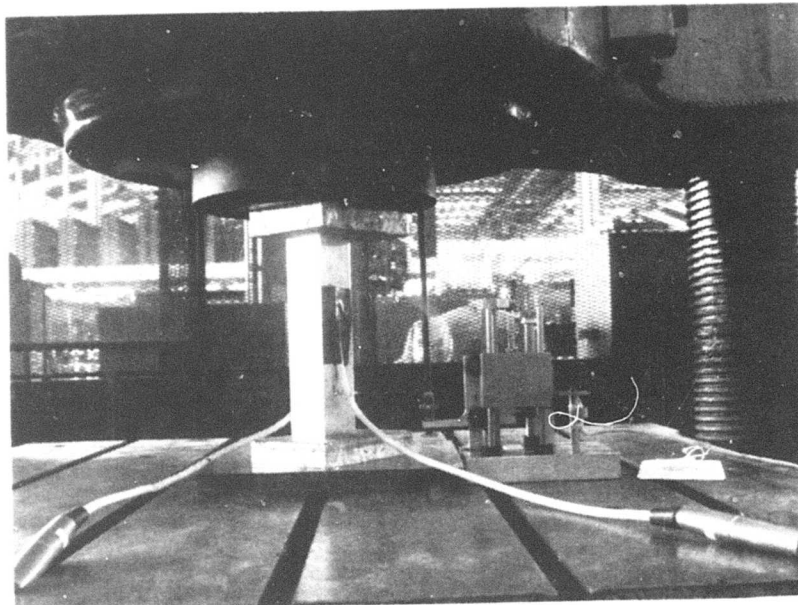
TYPICAL TEST ARRANGEMENT FOR CRIPPLING SPECIMENS
